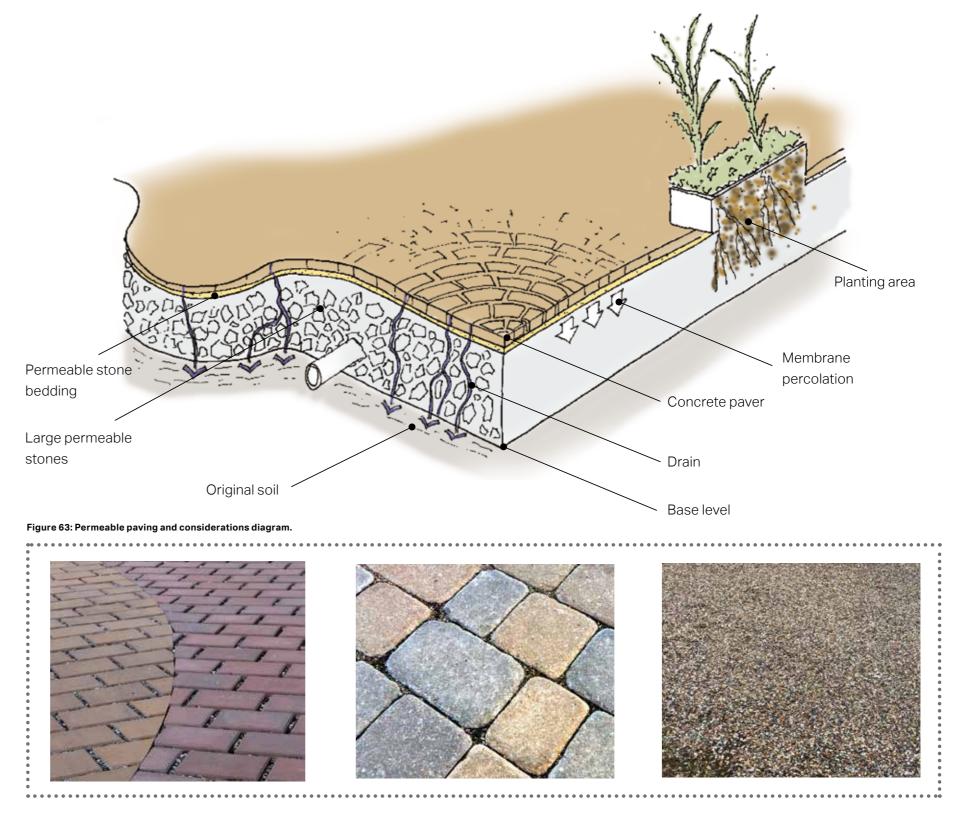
Examples of permeable paving treatments: clay pavers, stone/precast concrete setts, and unbound gravel.
